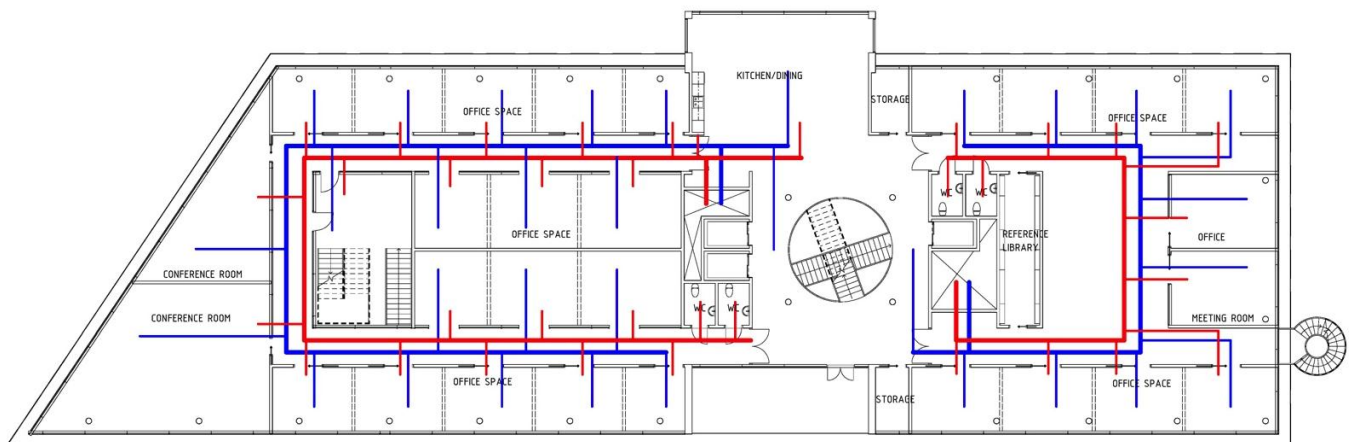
d floor plan – principal schema of ventilation ducts, showing air supply in blue color, and outtake in red.
